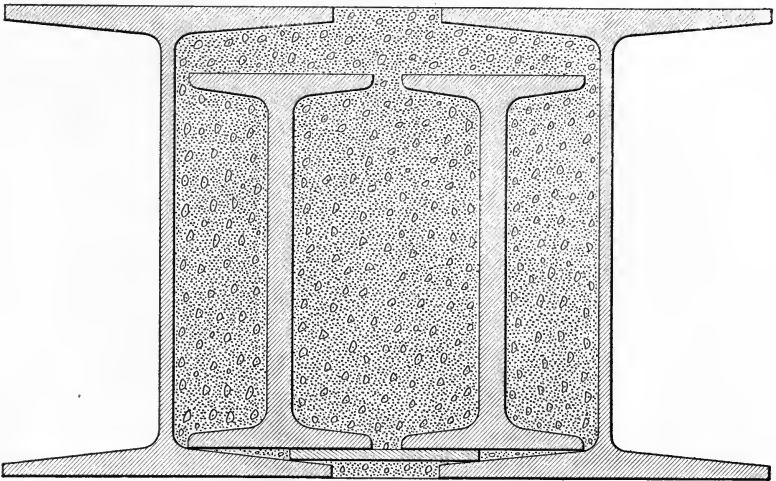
Showing Cross-Section of Needle-Beams Composed of 15" H-Beams and 12" I-Beams
